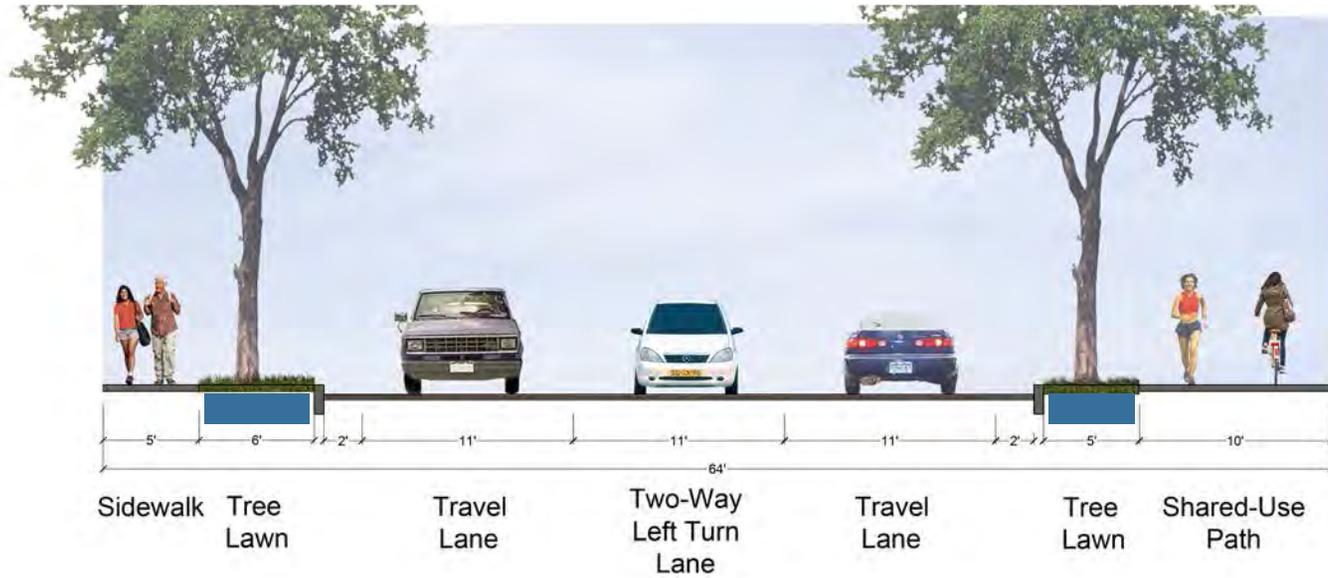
Section 9 Clinton Street - Shared Use Path Option
